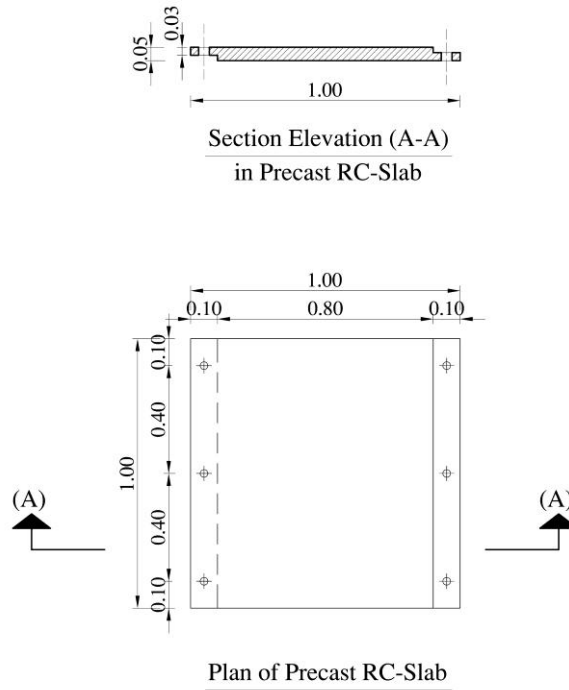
Typical detail of Precast RC slabs (Plan and Section Elevation).
